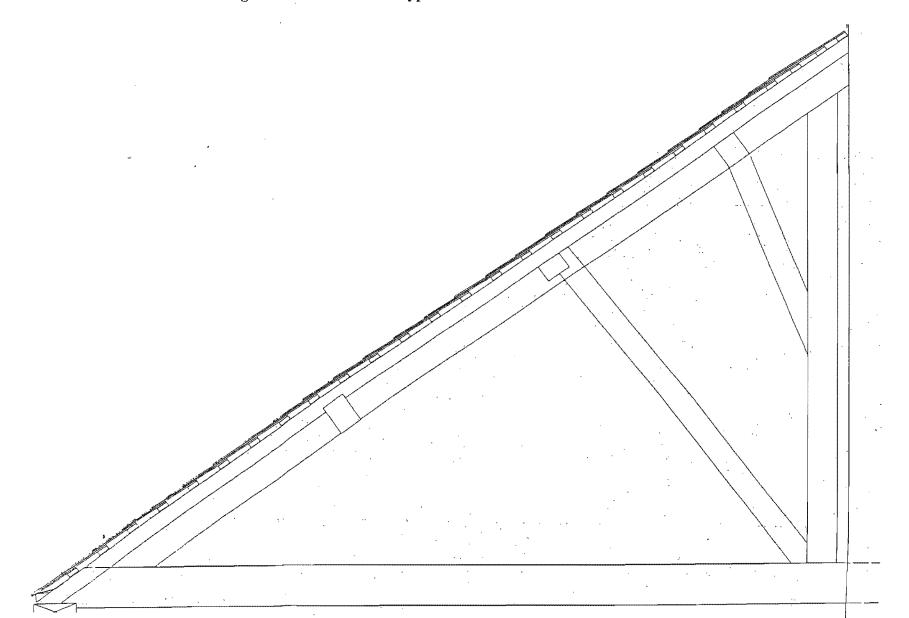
Illustration of a typical truss from the Choir south aisle roof
